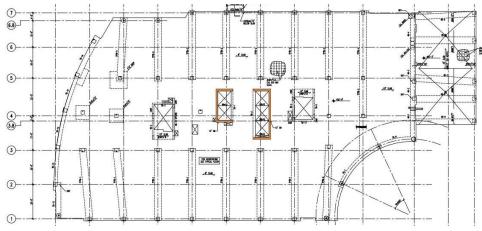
Shear Walls - 4<sup>th</sup> Floor
